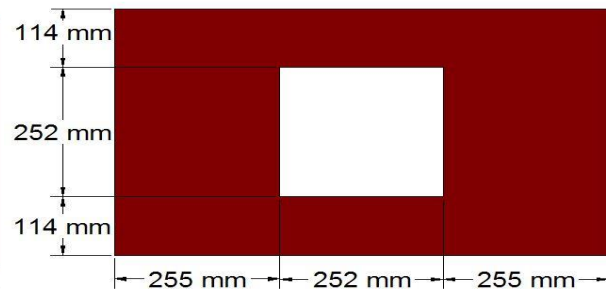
(d) Masonry wall with opening at the center of size 252×252
